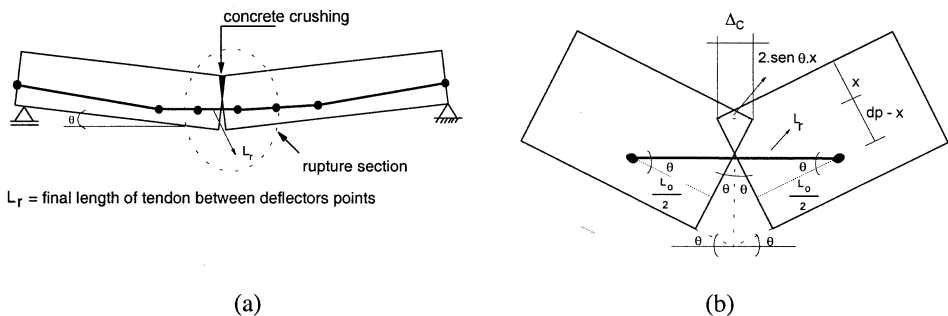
(a) Deformed beam with central hinge at failure and (b) critical section in detail.
